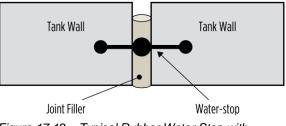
Typical Rubber Water Stop with Central Bulb
